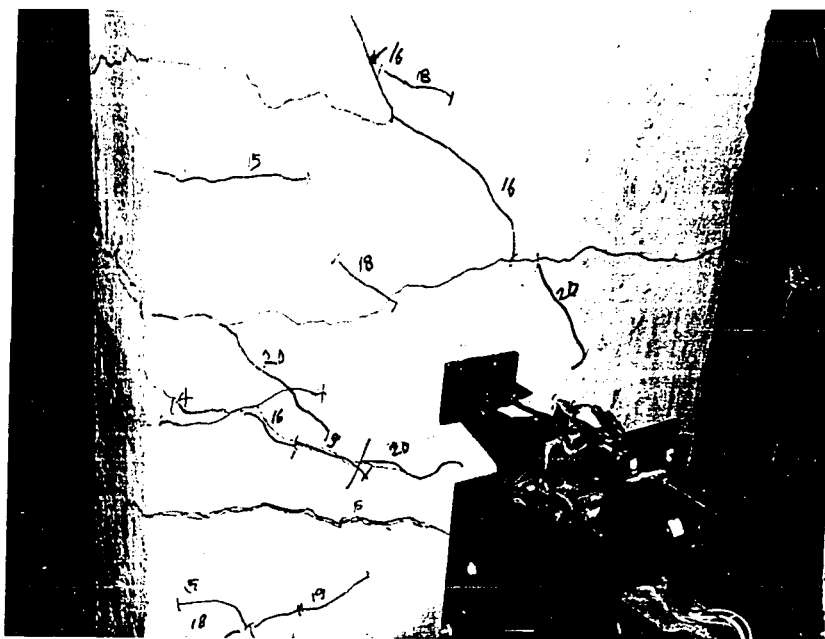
CRACKING AT WALL BASE - FRAME A
